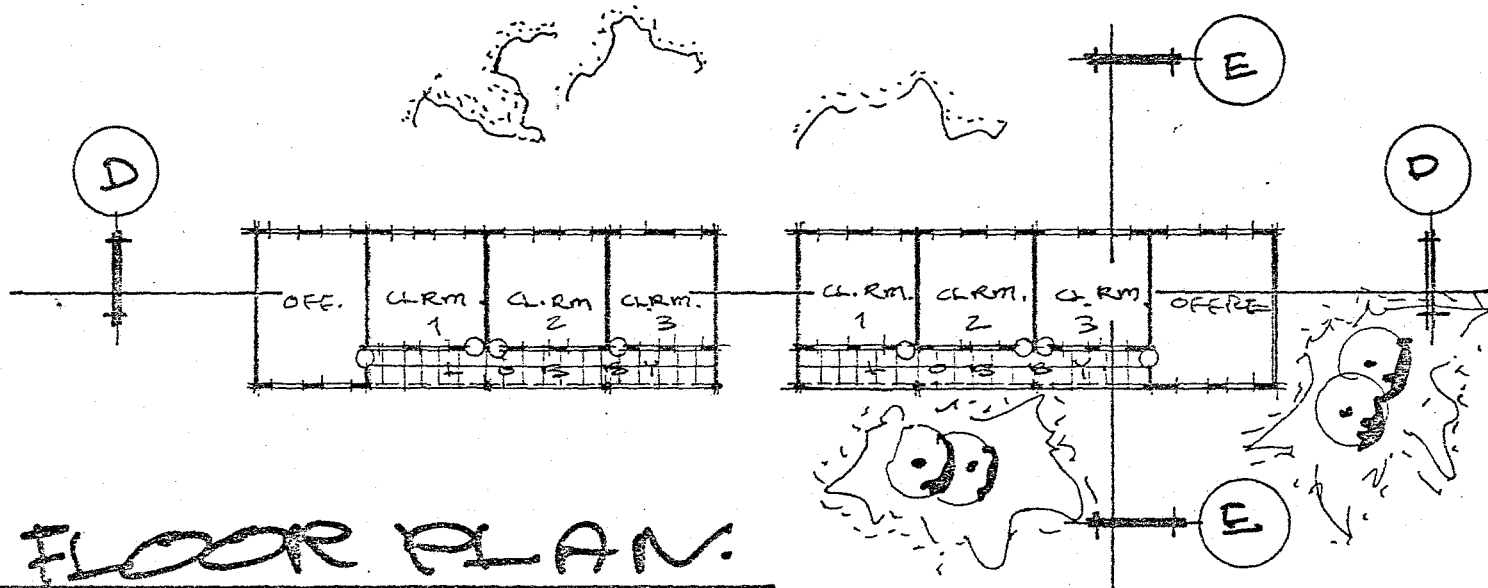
FLOOR PLAN OF KADUNA STATE YOUTH DEVELOPMENT CENTRE, RACE COURSE, ROAD KADUNA STATE.
